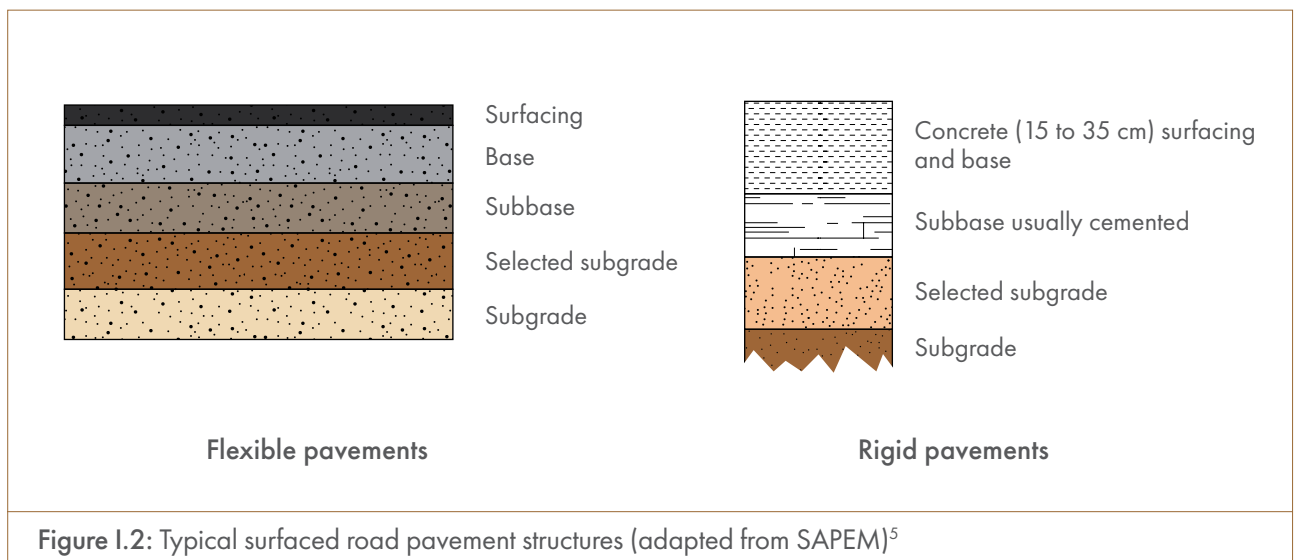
Typical surfaced road pavement structures (adapted from SAPEM)⁵
